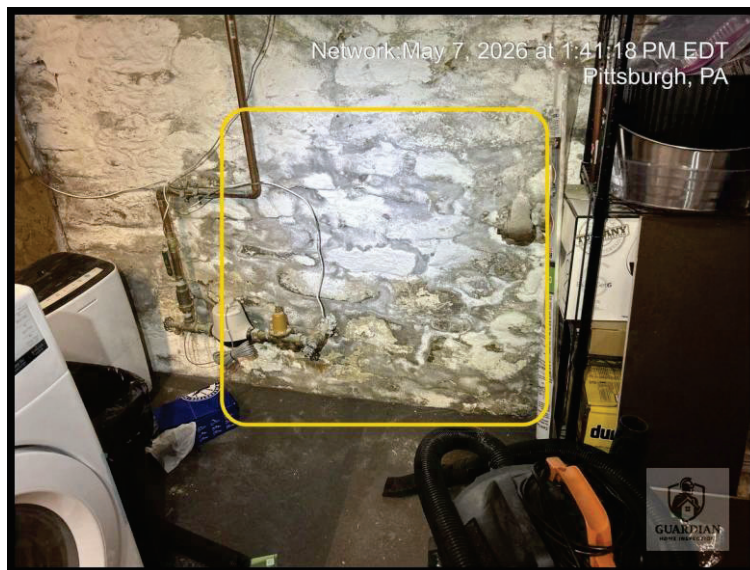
Minor moisture intrusion was observed along the front-facing basement foundation wall.
